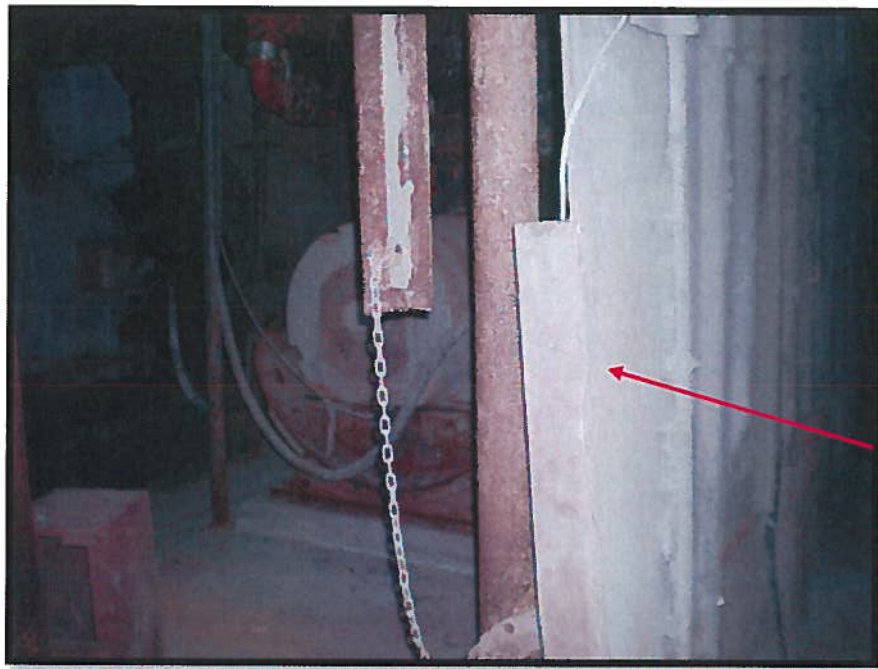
Asbestos-Containing Gasket Materials, Loose and Located on Piping throughout the Building (Sample 46).
